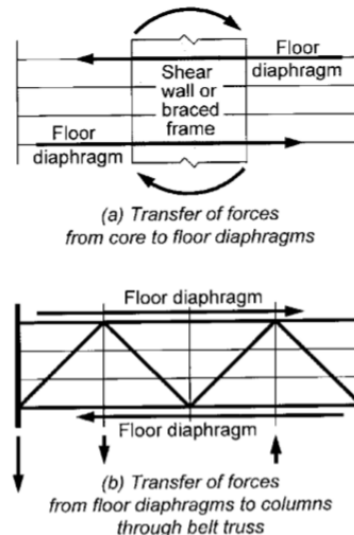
Force Transfer Using Belt Truss as Virtual Outrigger
